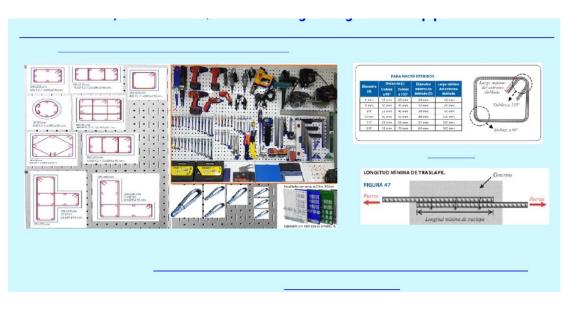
Board No.2: Reinforcement of structural elements with reinforcing steel Organization of equipment and materials, source: (Own with internet images)
